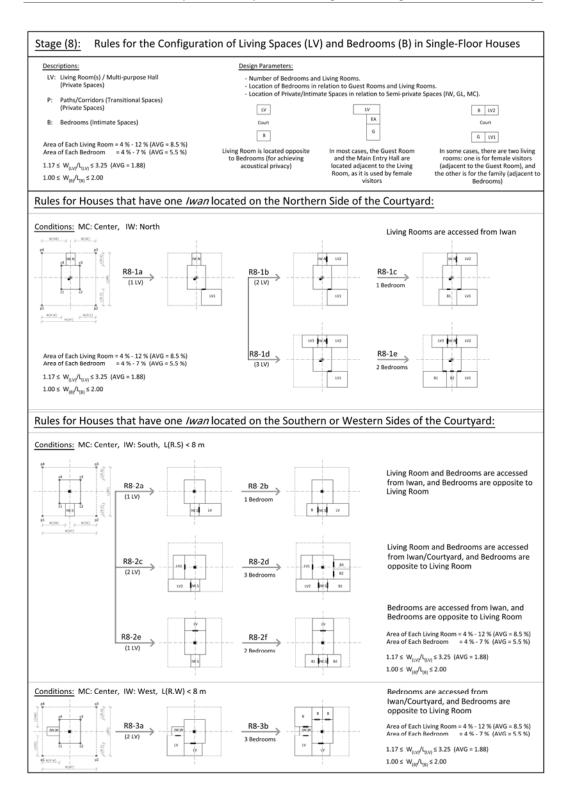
Sets of parametric rules for the configuration of living spaces and bedrooms in single-floor houses (part 1)
